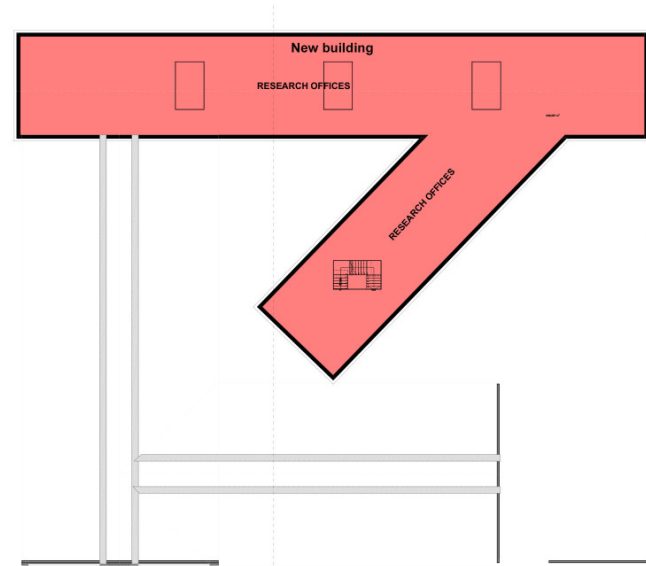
Third and fourth floor plans – June (Author, 2022)
